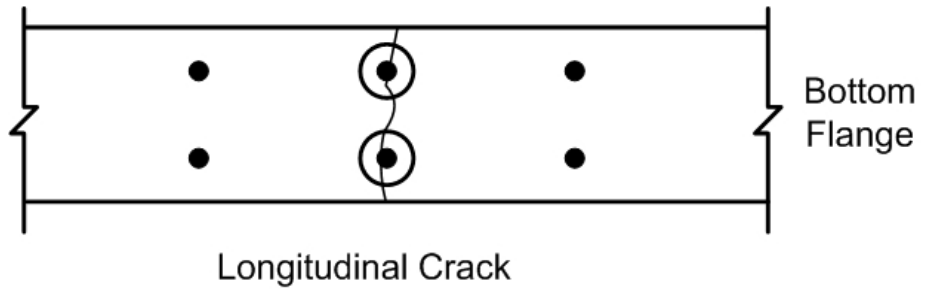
Prestressing Strand Corrosion and Section Loss Caused by Moisture Through Longitudinal Cracking
